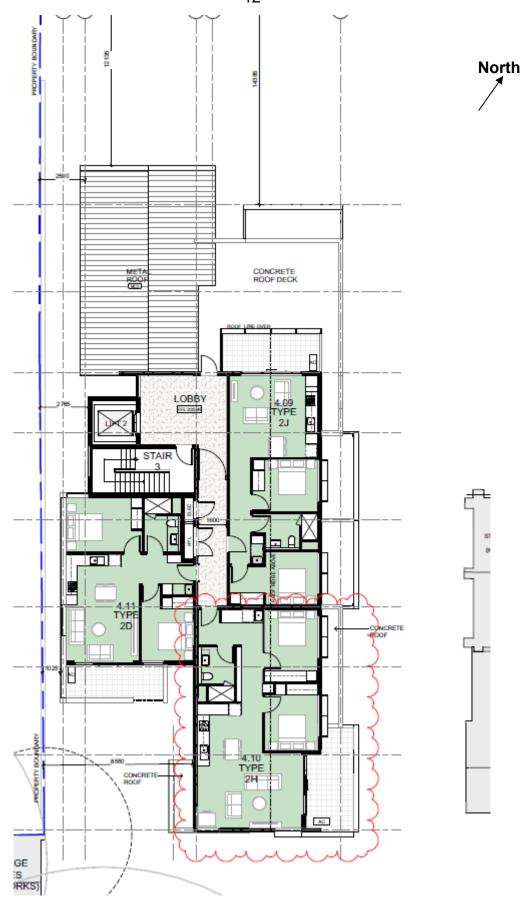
Level 4 floor plan of the proposed Building 2 of the St Andrew's Bendigo Housing Development.
